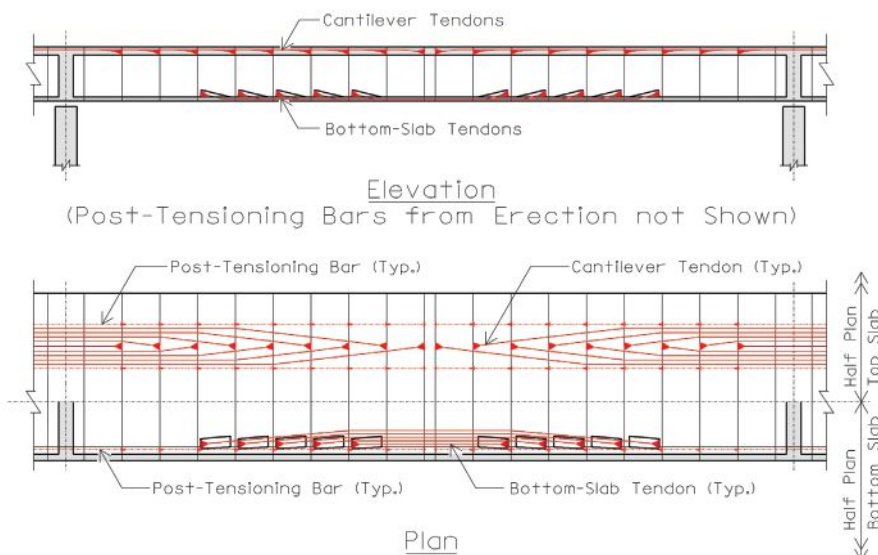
Typical post-tensioning layout for a constant-depth, balanced-cantilever bridge.
